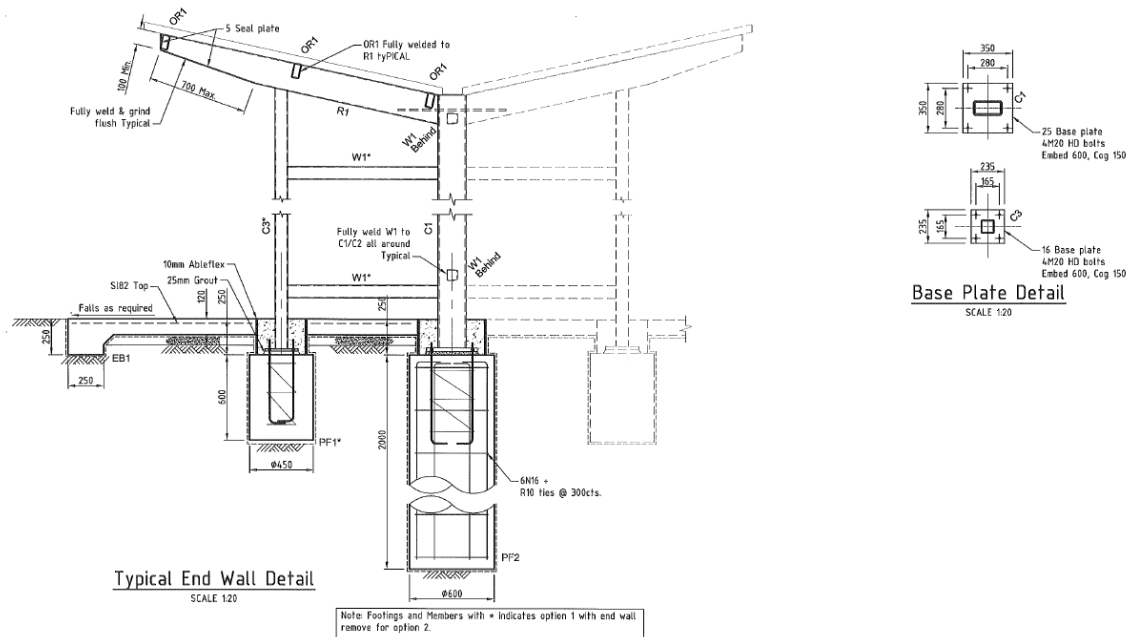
Bus Shelter Twin Model Footing and Slab Details Sheet 1
